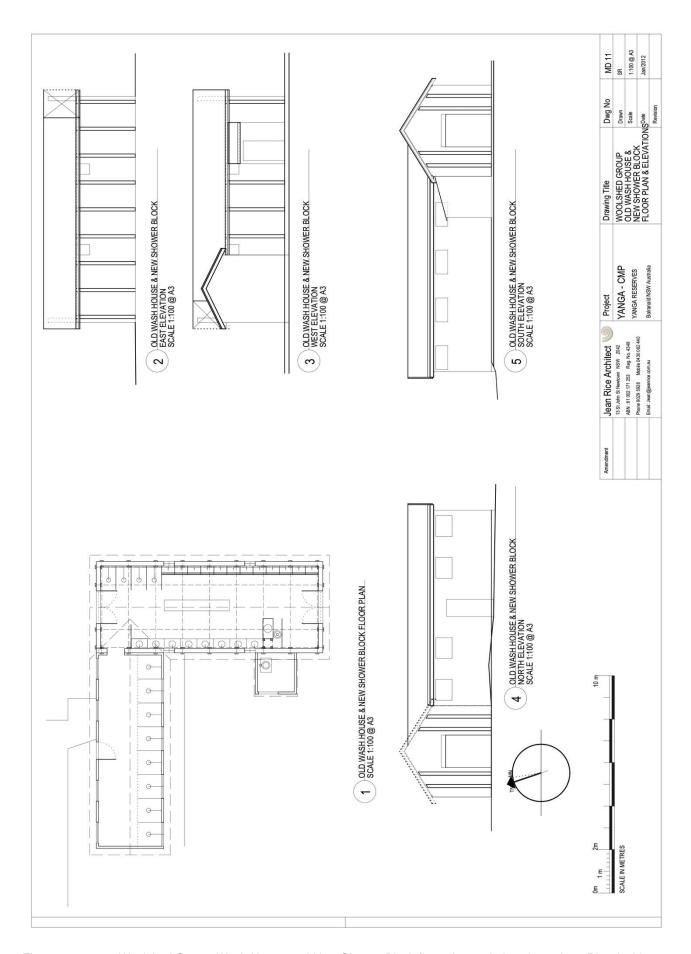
Woolshed Group, Wash House and New Shower Block floor plan and elevations. Jean Rice Architect, site assessment 2009.
